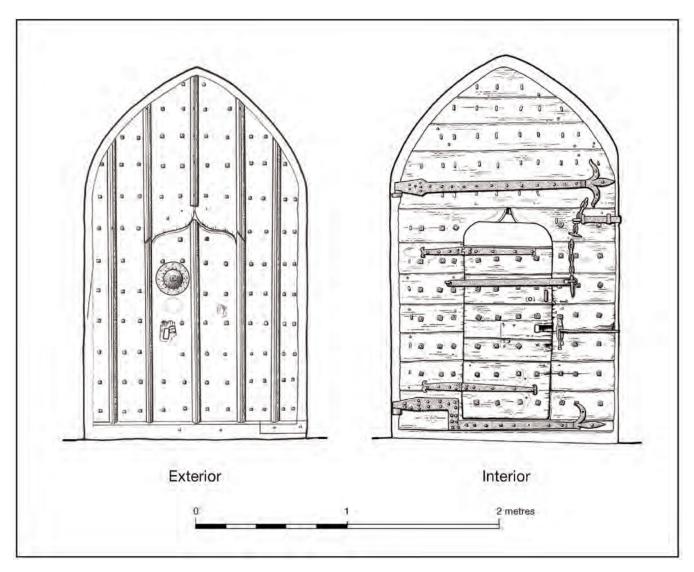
North door. External and internal elevations. Scale 1:25. Drawing: Simon Hayfield
